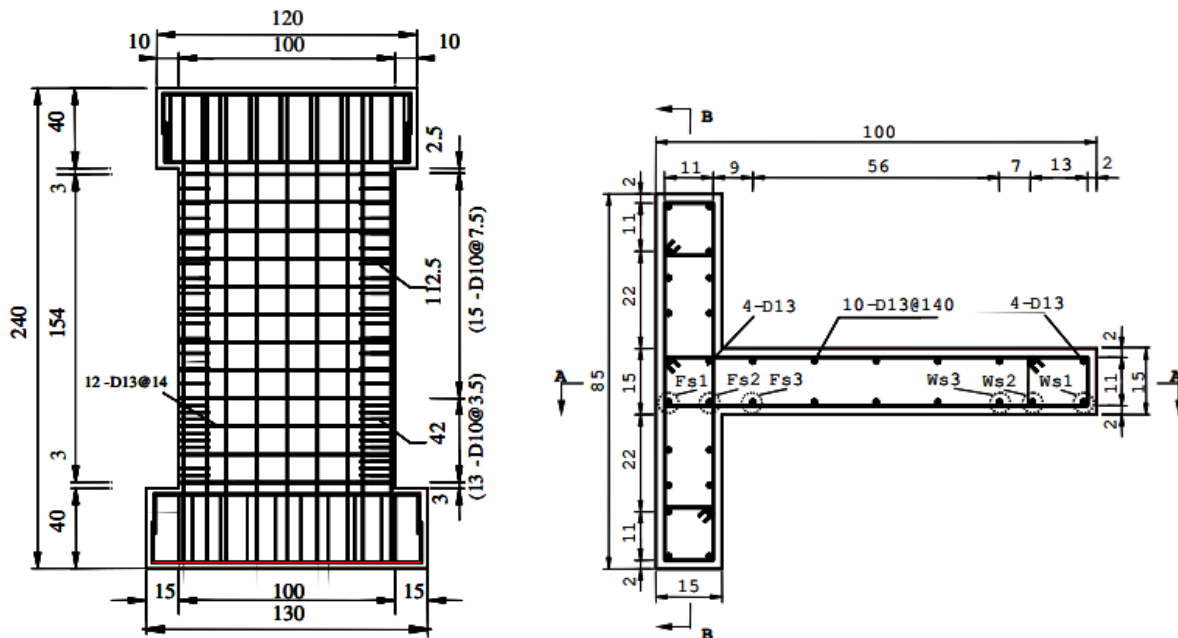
Test Specimen Geometry and Reinforcement Details for Specimen TC for Choi et al. [47, 86]
